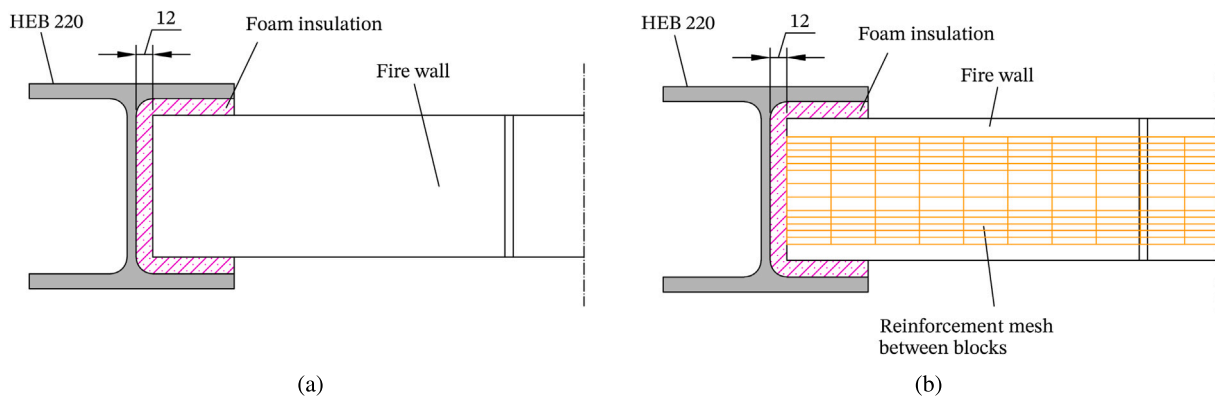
Firewall connection details: (a) without seismic detailing; (b) with seismic detailing. Dimensions in mm.
